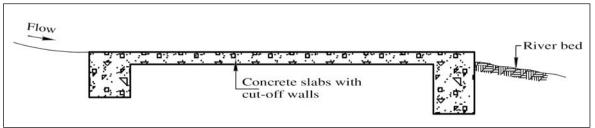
Drift constructed with a concrete slab and cut-off walls (cross-sections through drifts)
